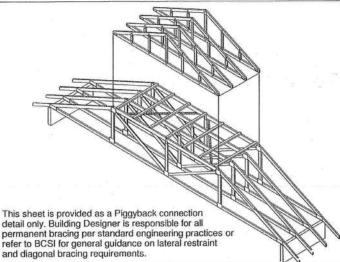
DETAIL IS NOT APPLICABLE FOR TRUSSES TRANSFERING DRAG LOADS (SHEAR TRUSSES).
